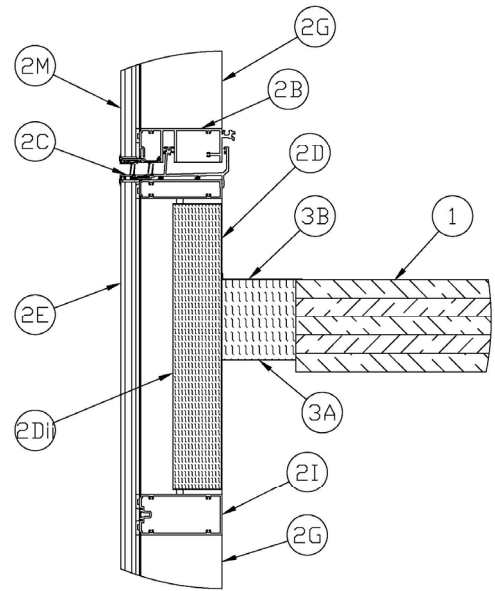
Base Detail Between Anchors (Kiss Transom)
